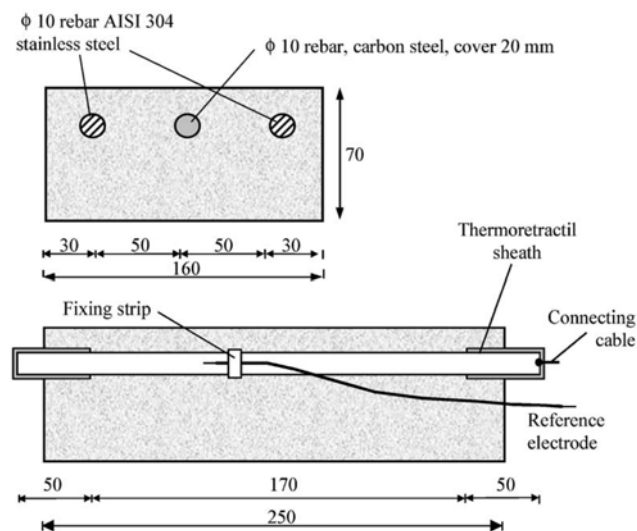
Cross section and lateral view of reinforced concrete specimen / Sezione e vista laterale del provino in calcestruzzo armato.
